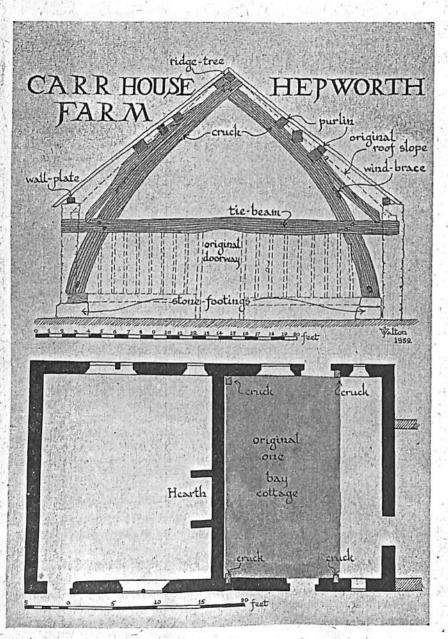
Plan and cruck truss of Carr House Farm Cottage, Hepworth
